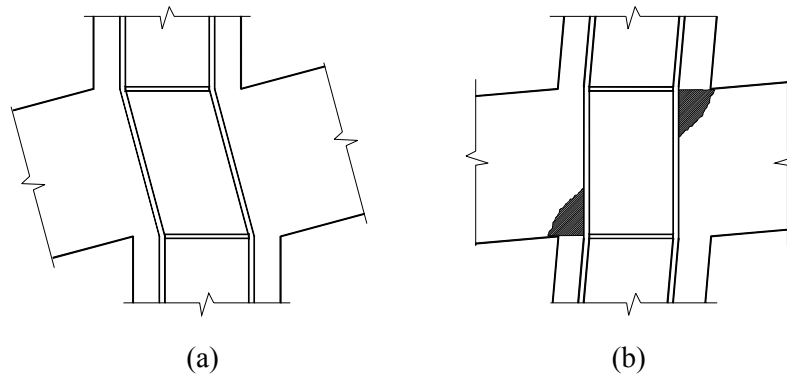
a) Panel shear failure, b) bearing failure
